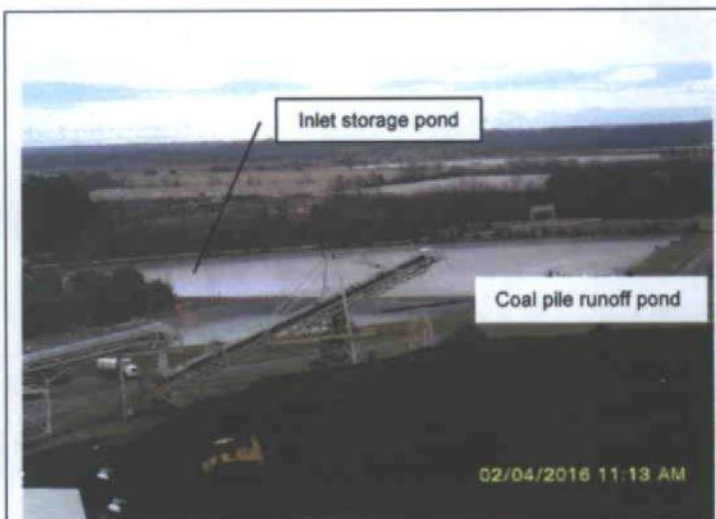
Overview of inlet storage pond and coal pile runoff pond.
